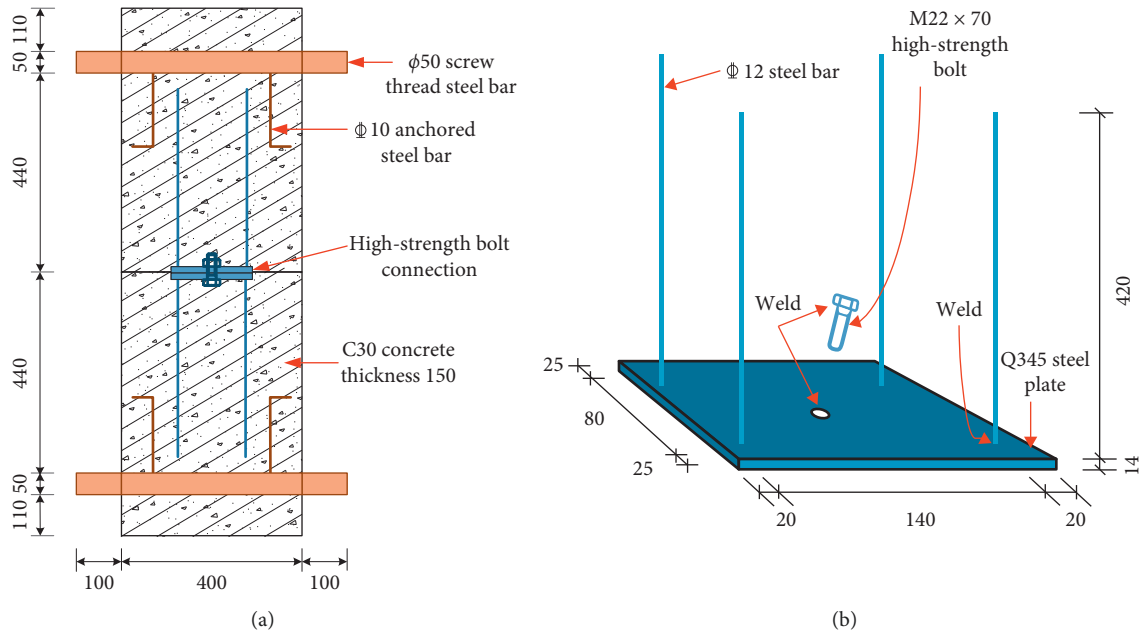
Configuration of the testing connection joint (unit: mm): (a) dimensions of the specimen and (b) dimensions of the embedded connection.
